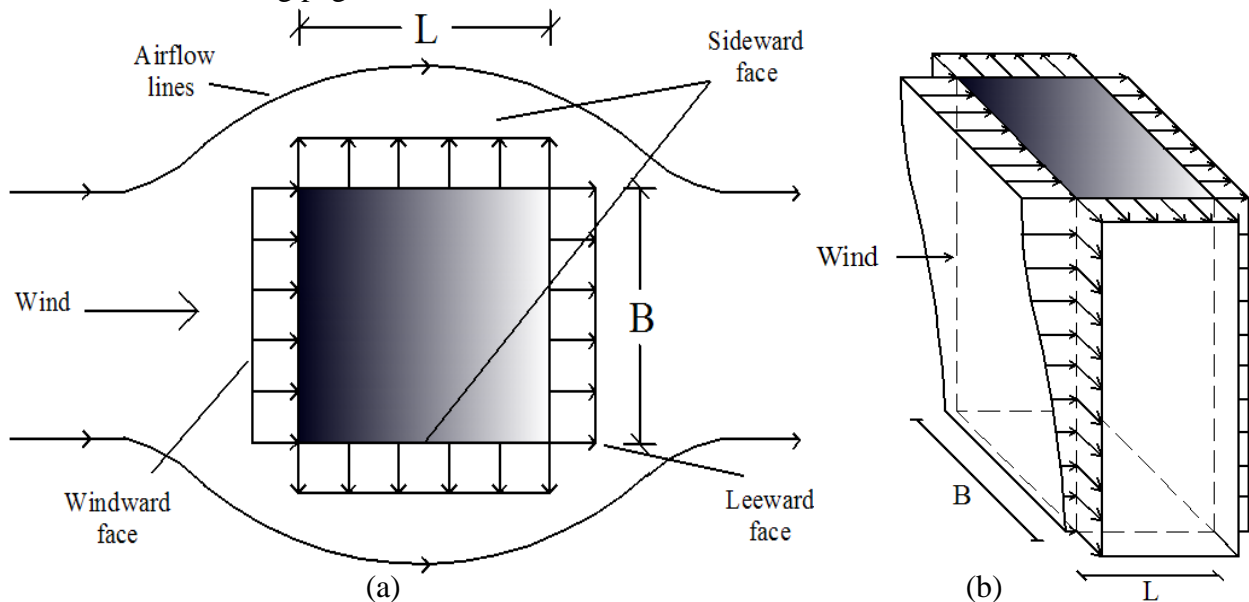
Typical wind load distribution on a multi-storey building in (a) plan view and (b) elevation view.
